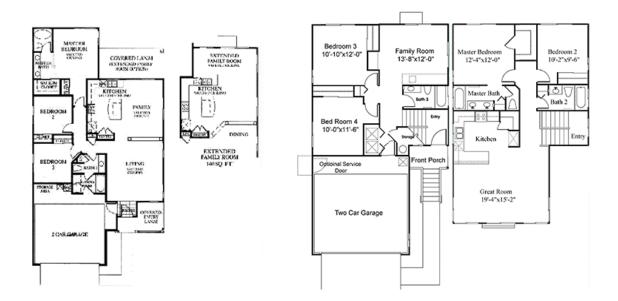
Floor plan of two single-family homes in Kapolei Knolls. The floor plan on the left shows a horizontal expansion and on the right, a vertical expansion. Source: Dhorton.com
